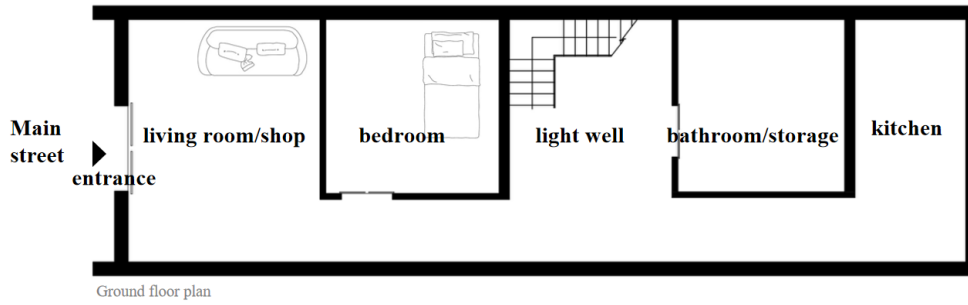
Schematic layout of Bamboo tube house in the Republic of China (Source: by the author)
